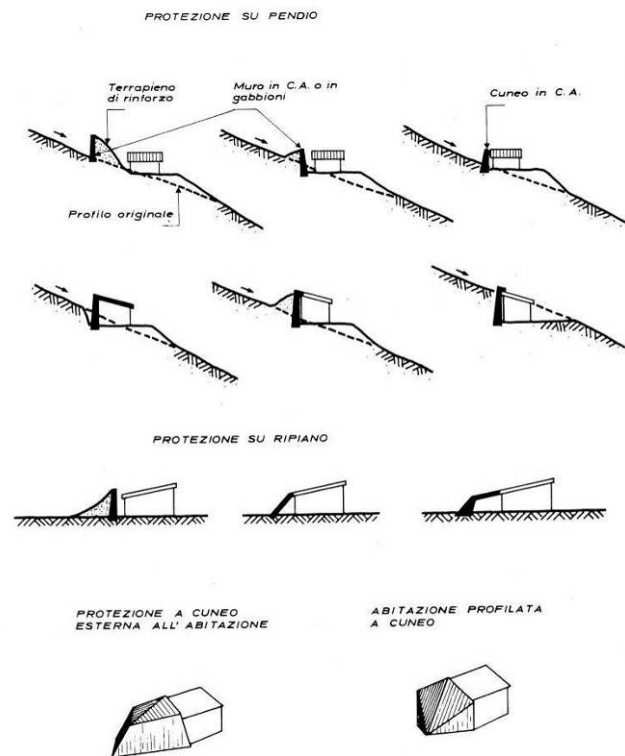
Example of building reinforcement techniques [Menegus & Soranzo, 1986].
